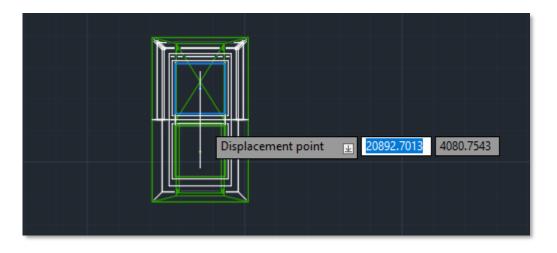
Combination roof hood and inlet products placement in AutoCAD drawing
